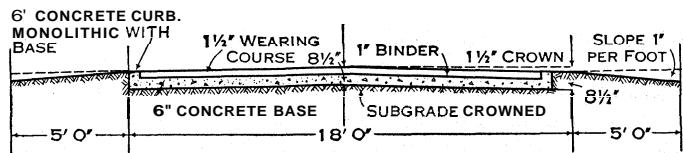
CONCRETE PAVEMENTS IN THE UNITED STATES
